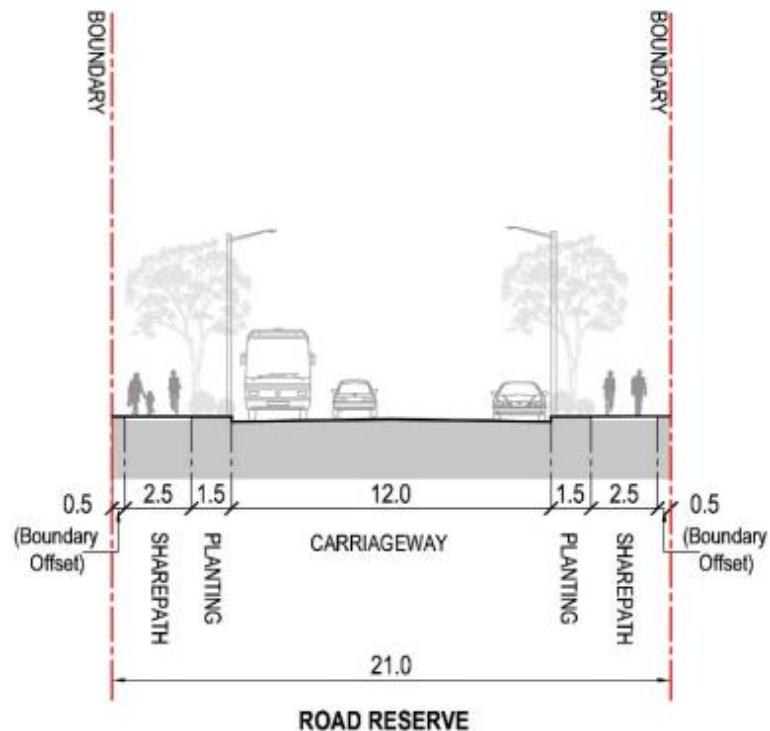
Proposed (2-lane) sub-arterial road cross-section
